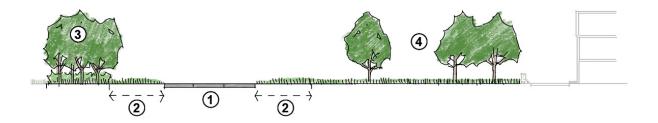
Cross section of southern section of Outer Link Road (40m corridor)
